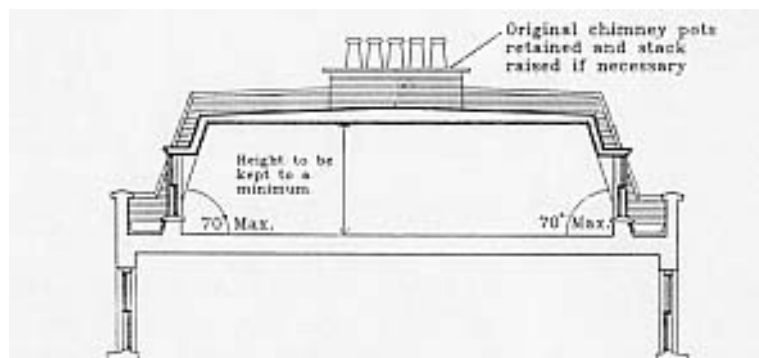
A: Flat-topped Roof Extension, Diagrammatic Section.
